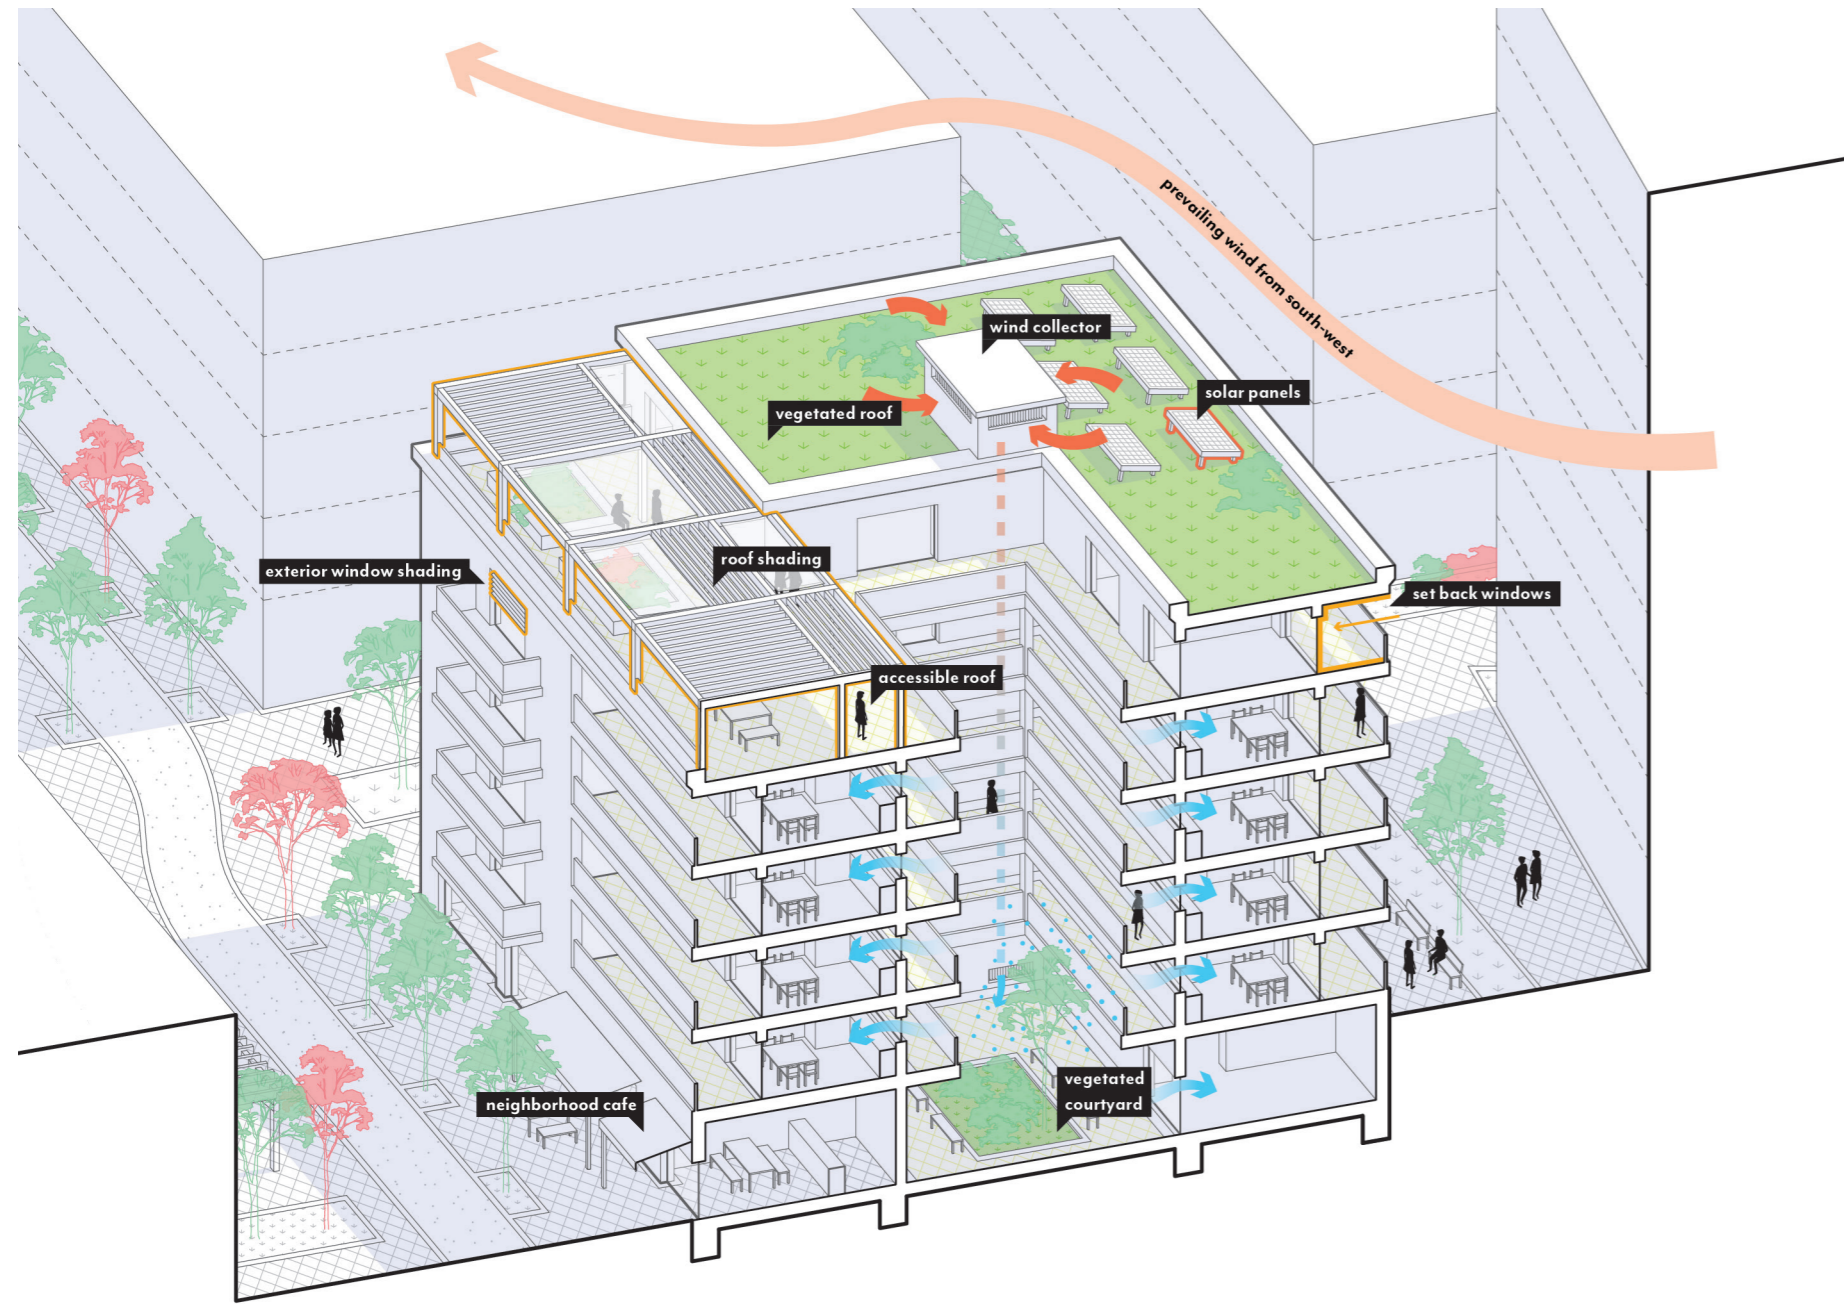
Exemplary section of a residential building with climatic adaptations, rooted in the traditional Beirut architecture.
